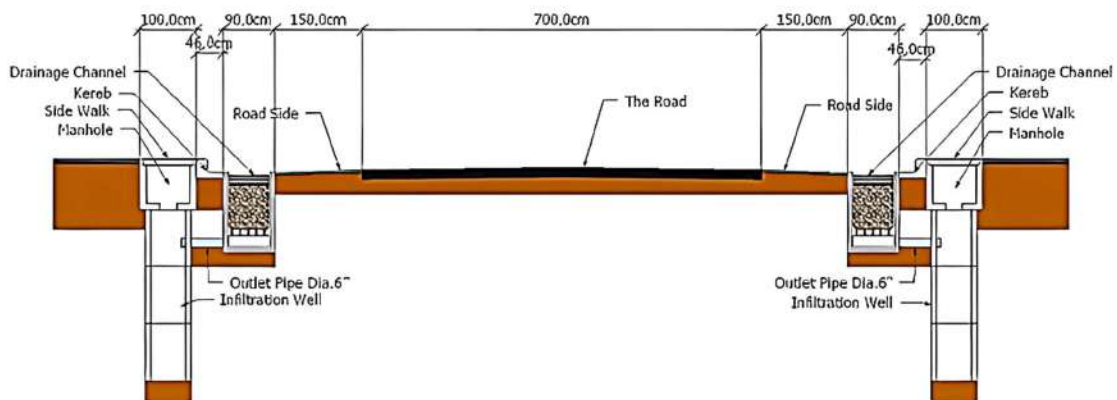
8: Cross section showing drainage design (*Stormwater Drainage Conveyance Systems (Non-BMP related) General Design and Construction, 2023*)
